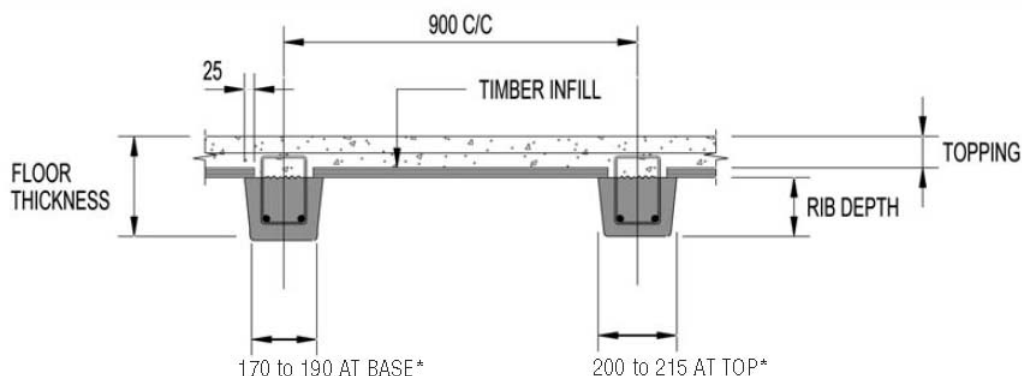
Cross-Section Dimensions of Concrete Rib and Infill
